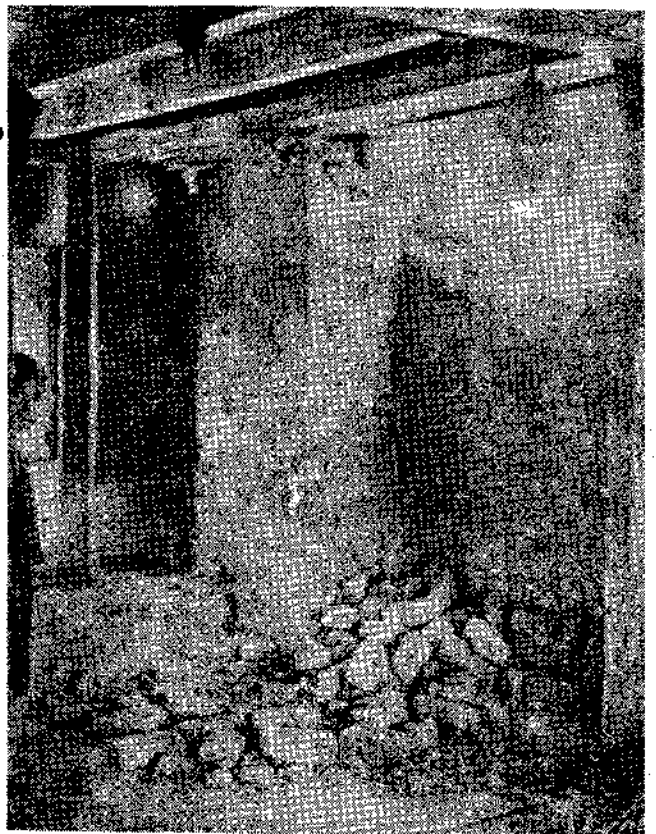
Damage of Upper Storey Adobe Pier and Panel
